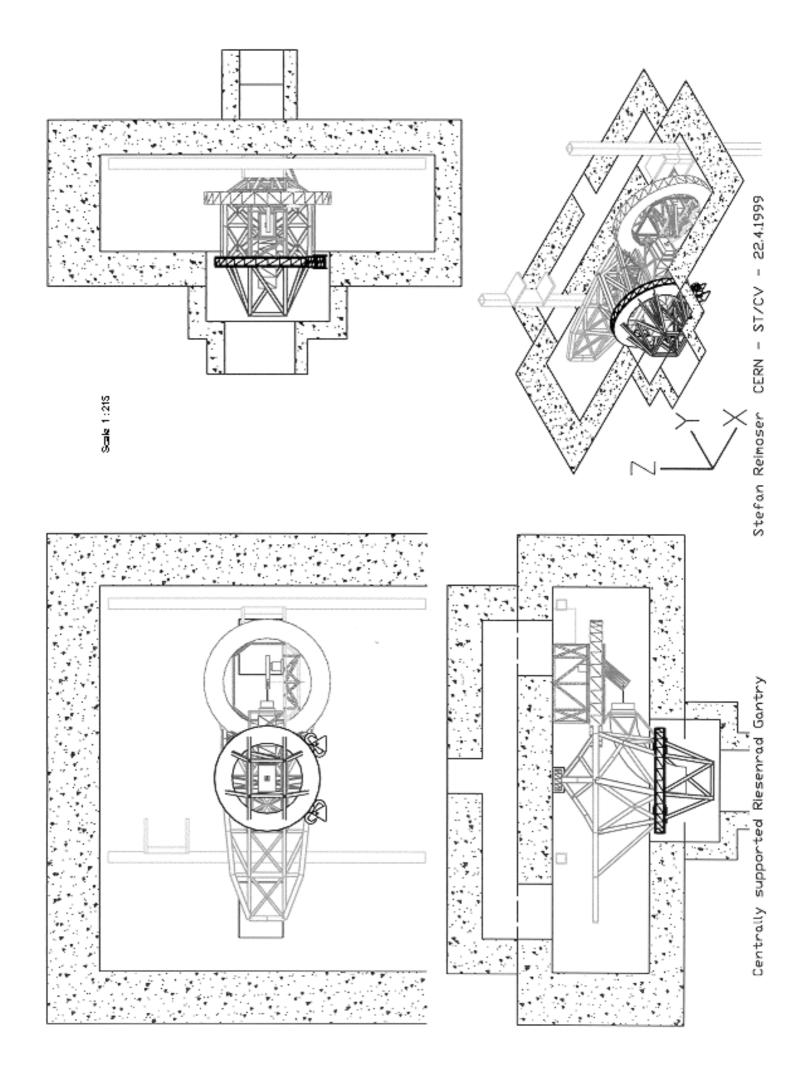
(following page): Plan, elevation and perspective of the Centrally Supported Riesenrad Gantry.
